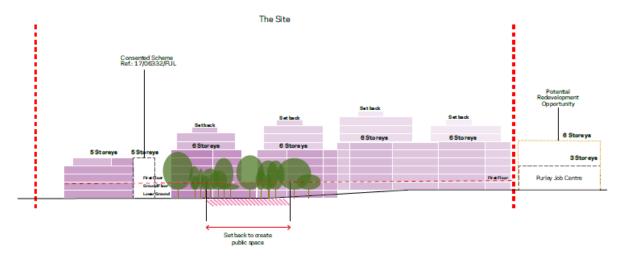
Massing Section of front elevation showing land level changes and relative floors.
